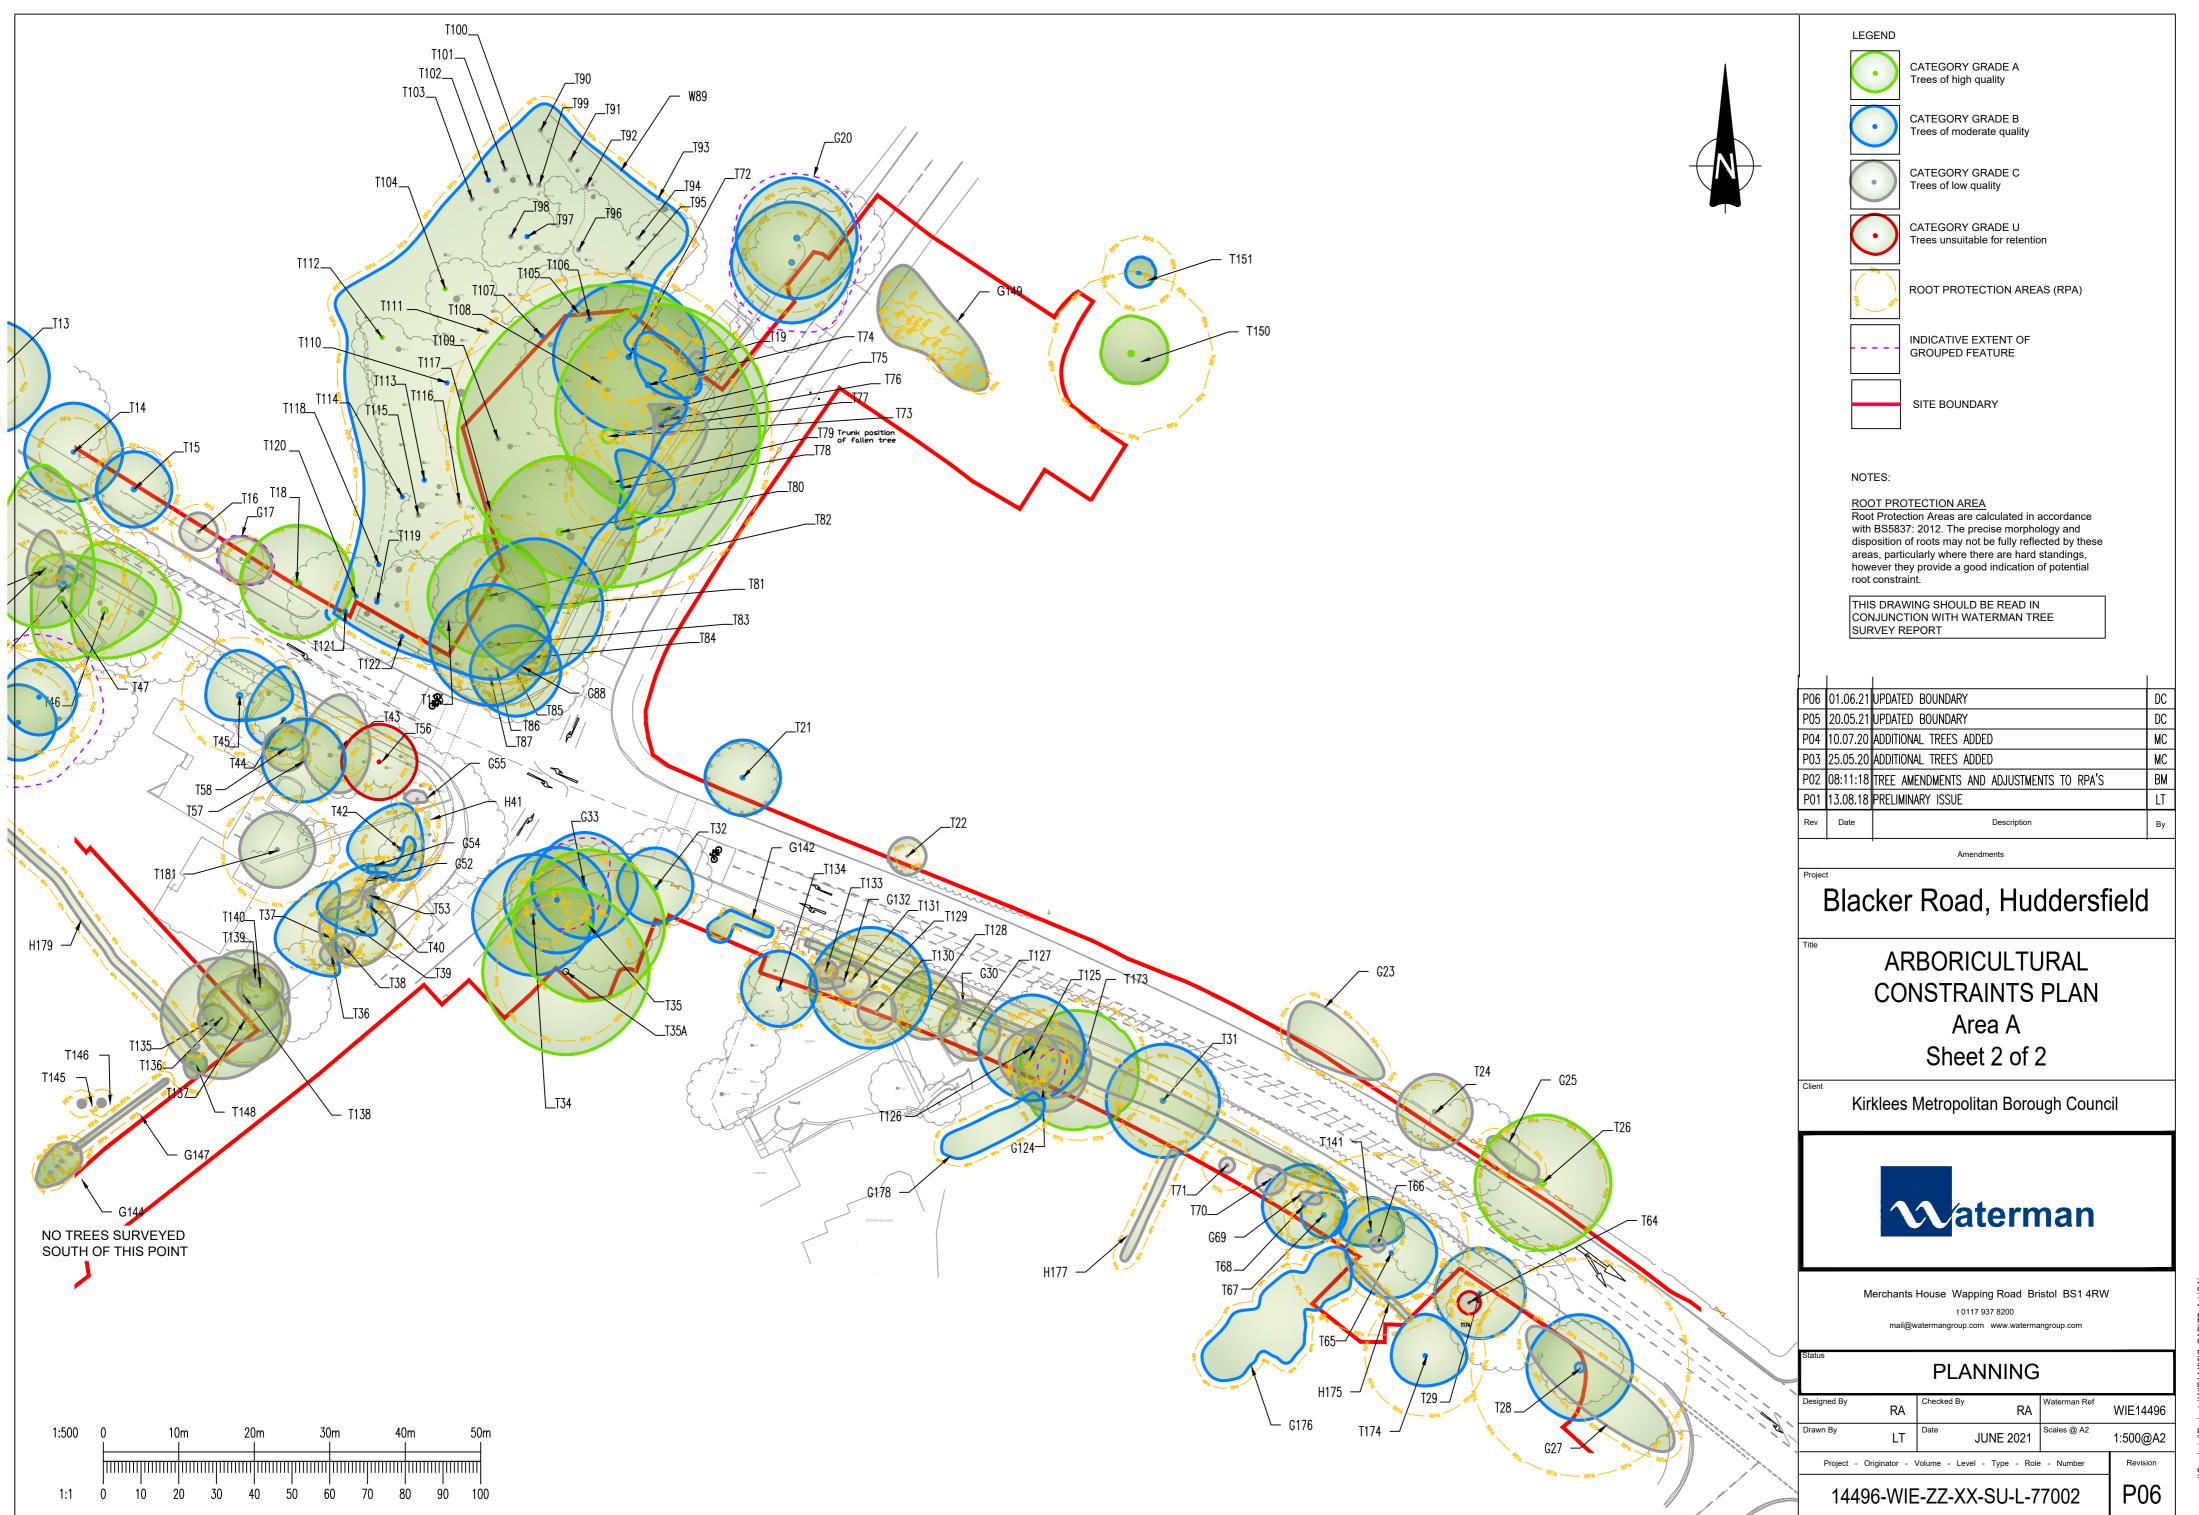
Arboricultural Constraints Plan Sheet 2 of 2 (ref.14496-WIE-ZZ-XX-SU-L-77002)
